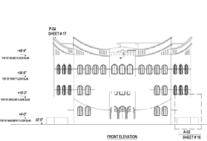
Plan of a typical reinforced-concrete building in Pakistan.
